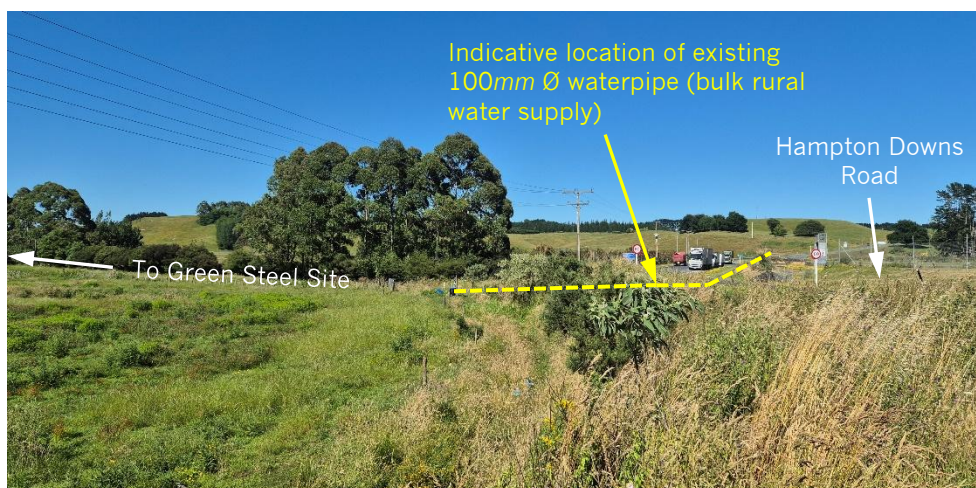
Figure D: Photos illustrates the TKWA 100mmØ pipeline that runs east from the intersection with Hampton Downs Road, crossing Hampton Downs Road, providing a potential connection point on the southern side of the Green Steel site.
